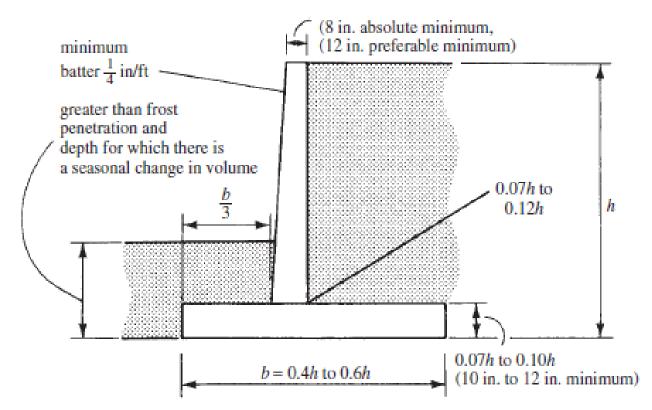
Rules of thumb for proportioning cantilever retaining walls.
